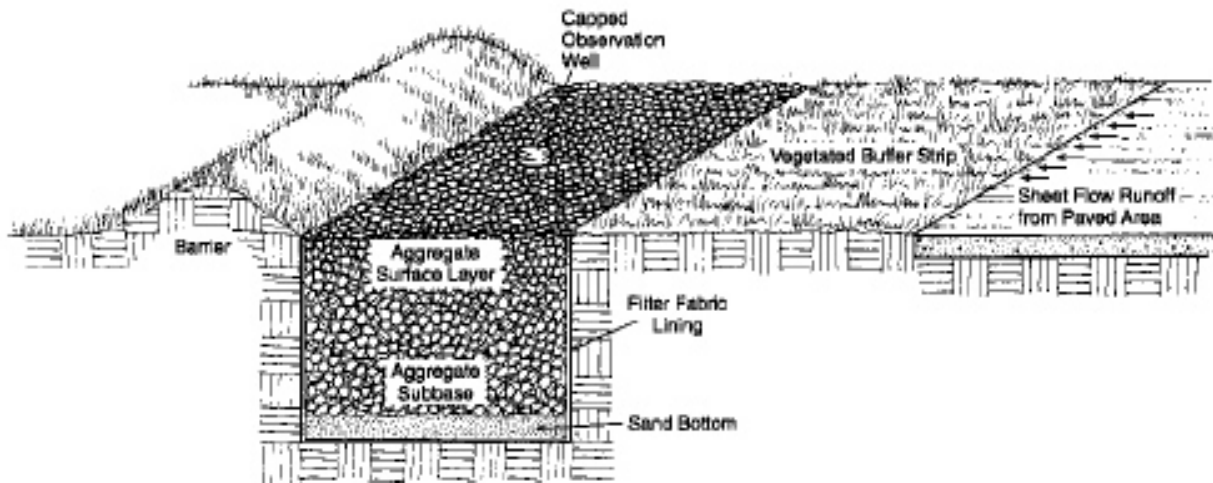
Infiltration trench detail (Source: GSWMM, 2001)
